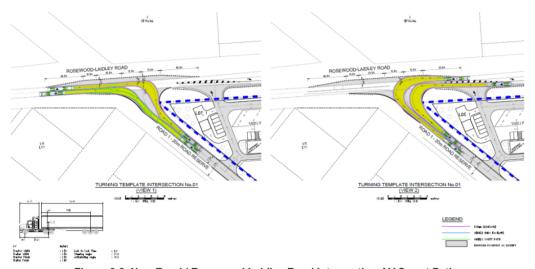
New Road / Rosewood Laidley Road Intersection AV Swept Paths
